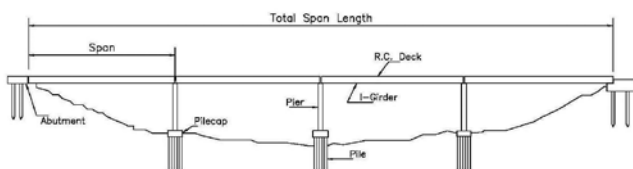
LONGITUDINAL SECTION FOR SIMPLY SUPPORTED BRIDGE
